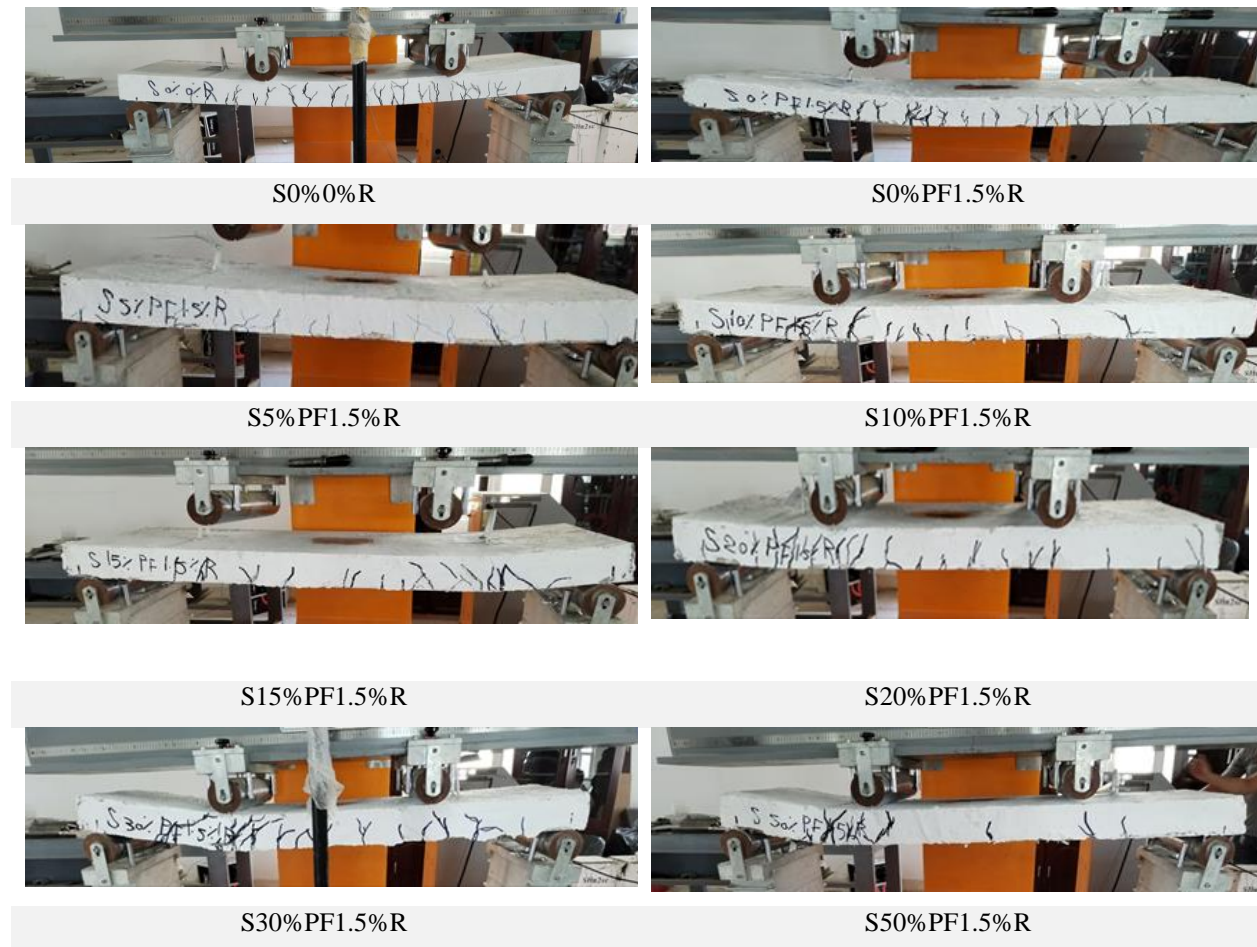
The Crack Pattern for Concrete Slabs Reinforced with Steel Bars.
